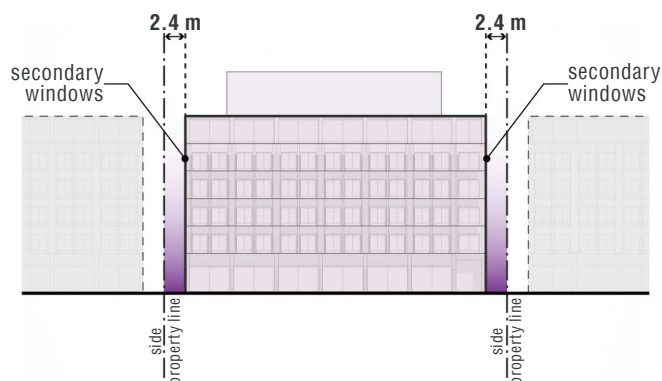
Illustration of 6 storey mid-rise building side yard setbacks in residential contexts, where a minimum of 2.4- metre side yard setback is required.
